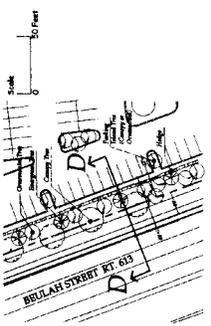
Detail B: Park, Terrace, Greenway to Recreation Entry
